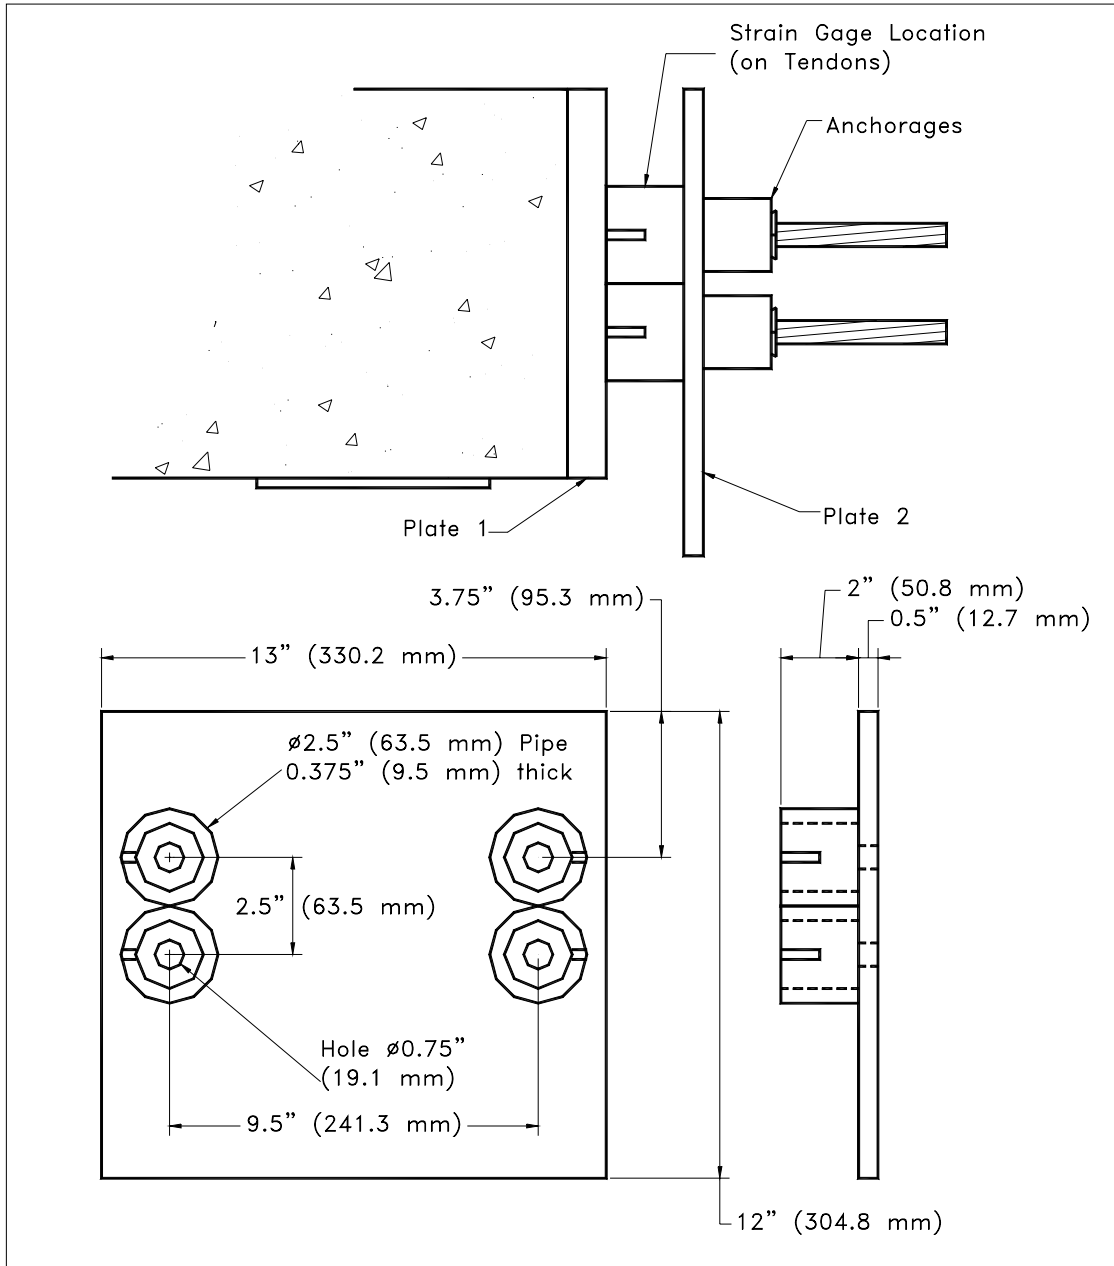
Las Vegas Box Girder Strain Gage Plate Plans
